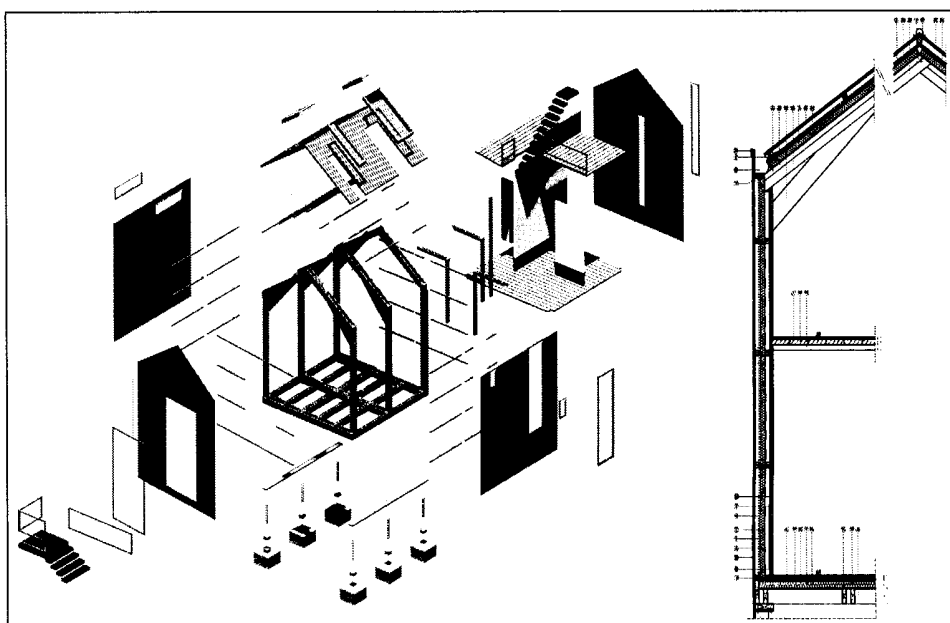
The assembly kit for emergency situations; exploded axonometric view and section
